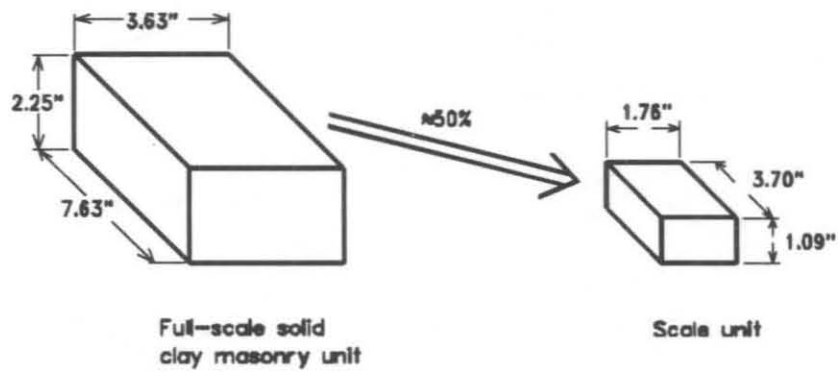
Dimensions of Full-scale and Reduced-scale Clay Masonry Unit
